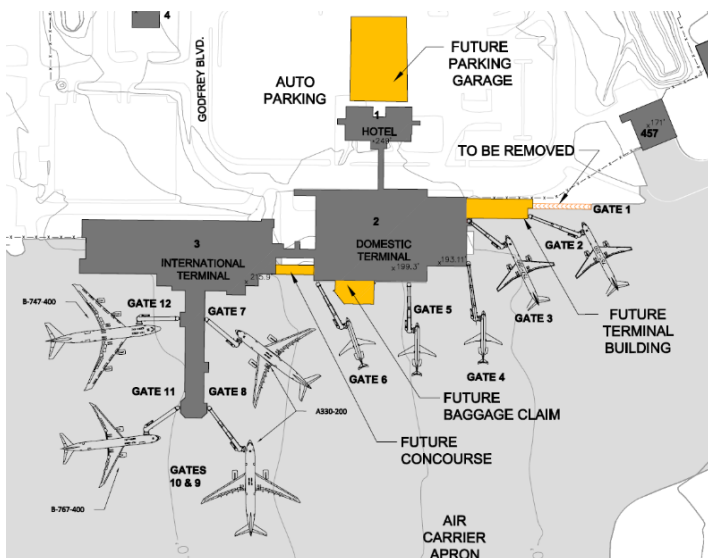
Terminal Area Development Plan – 2014 Master Plan
